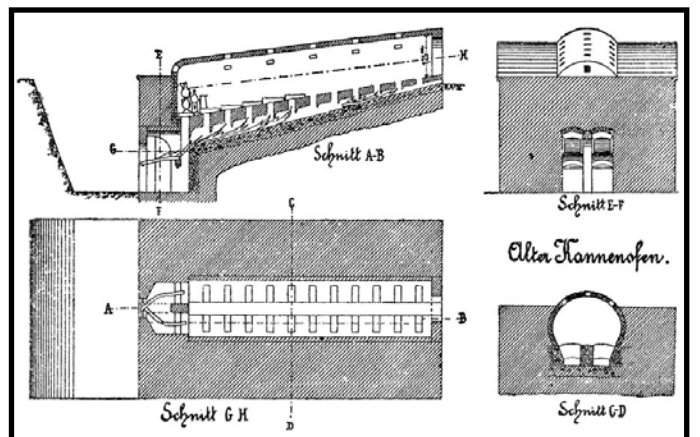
Cross-draught stoneware kiln with a rectangular ground plan, one sunken fireplace and two flues, Westerwald type. Raeren, Belgium, 1887 (Schiffer 1887, Fig. 2).
